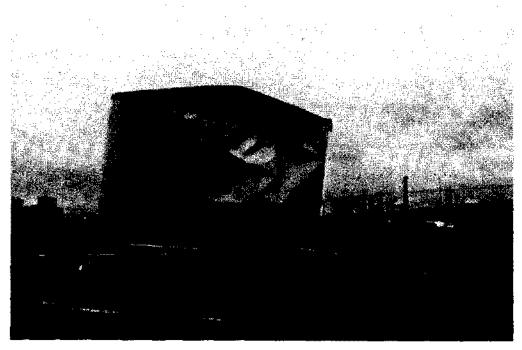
Storage Tank Overturned and Damaged by the Edmonton Tornado.
